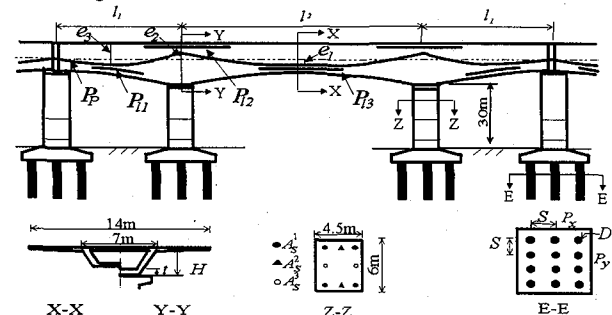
Design variables of a three-spans continuous prestressed concrete box girder bridge system
